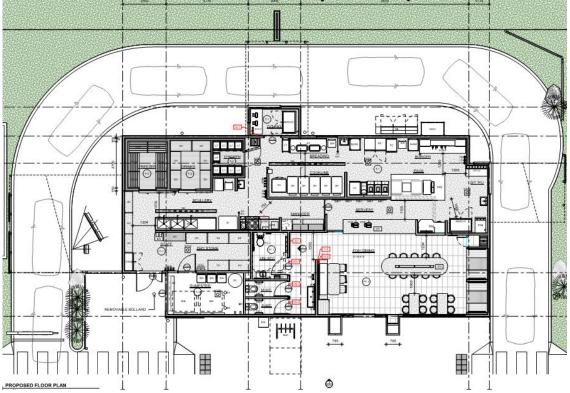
Floor plan and associated drive-through (Source: Urbis report p.98)
